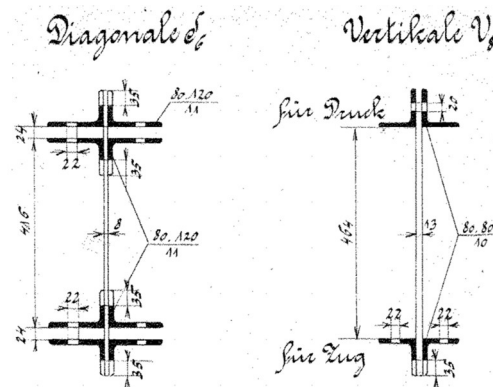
Typical built-up sections of main truss diagonal (left) and post (right).
